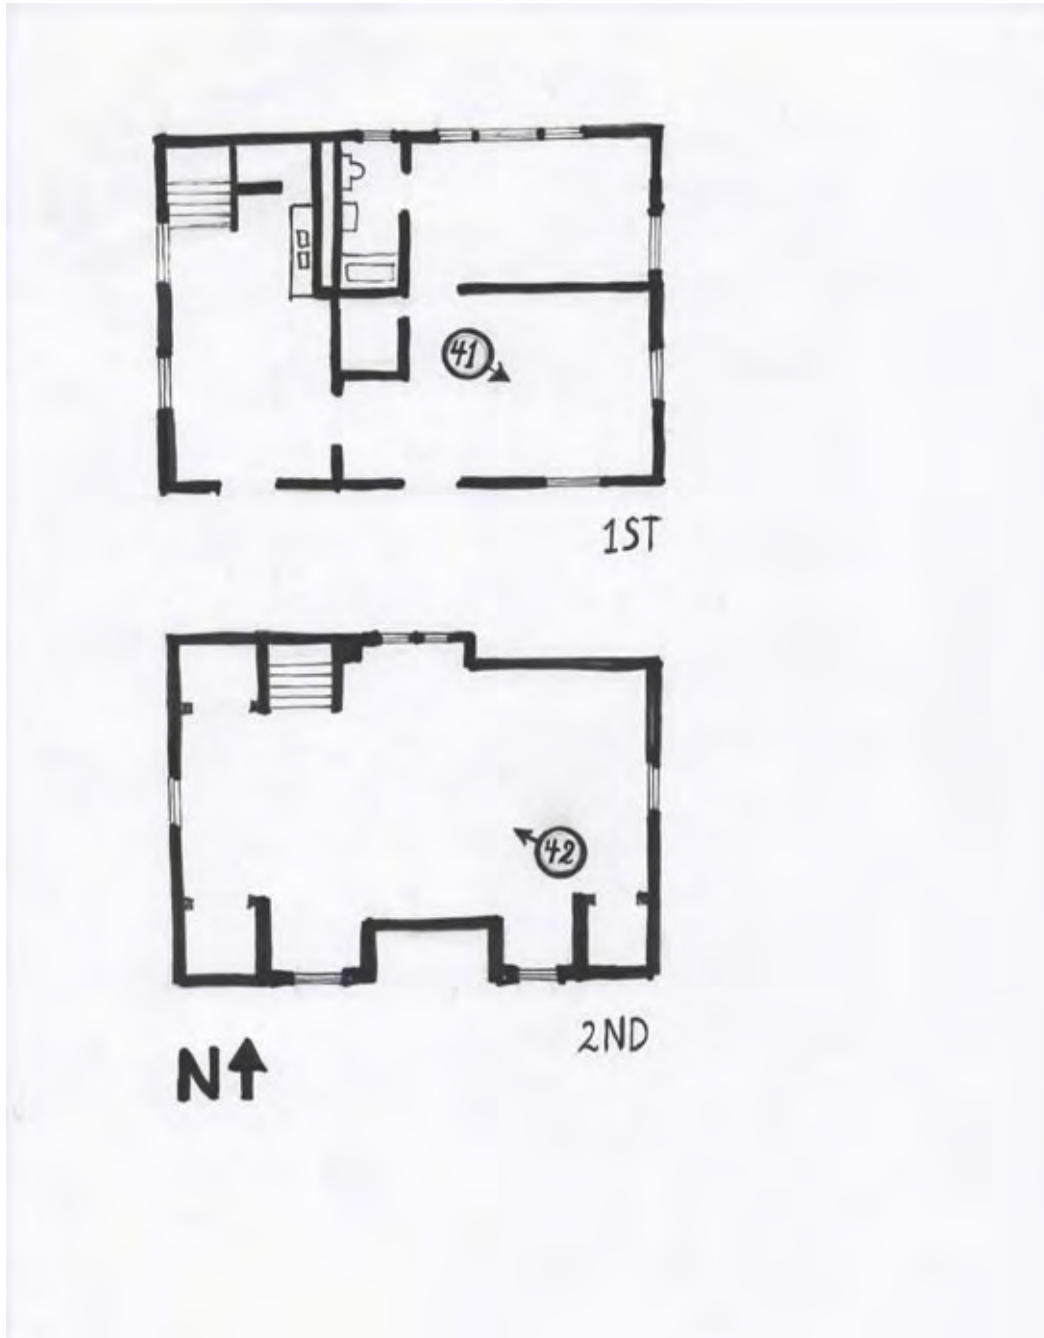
Carriage House, Interior First and Second Floor Photo Keys
